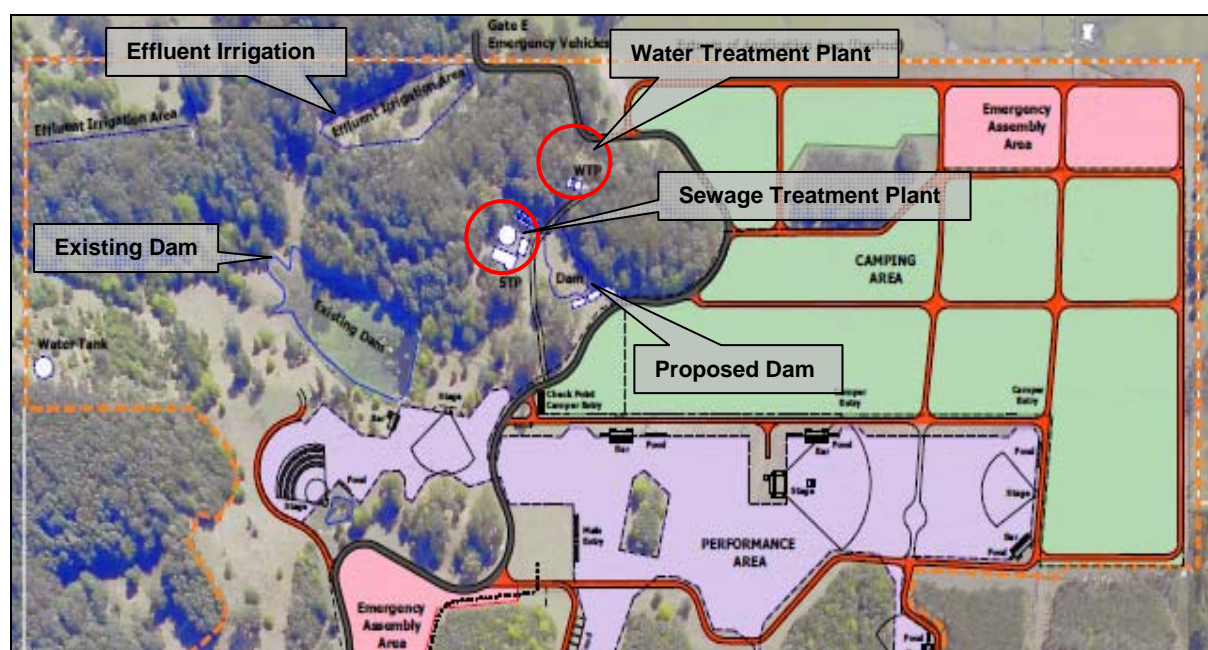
Location of Proposed Water Treatment Plant and Wastewater Treatment Plant (source: Preferred Project Report)
